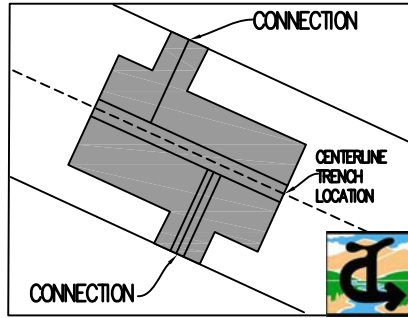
Example 12: Damaged pavement within 10 feet of a patch must also be patched.
